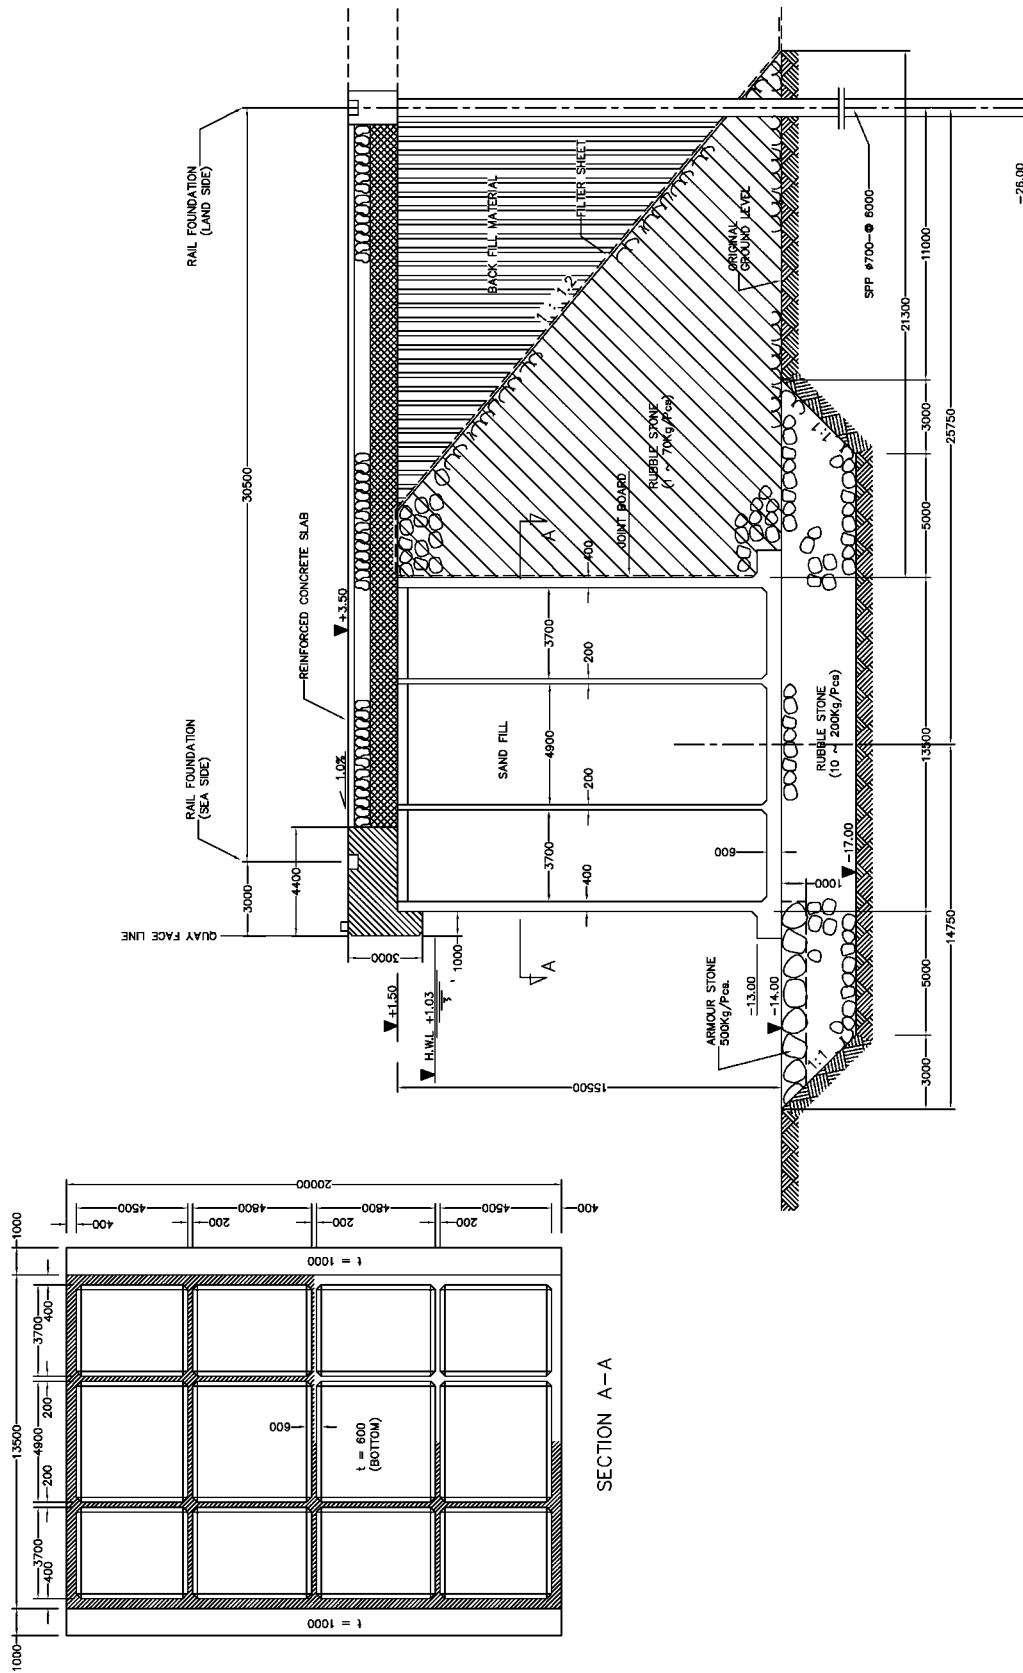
F-13 Typical Section of Caisson Type Container Berth of Bojonegara Port
